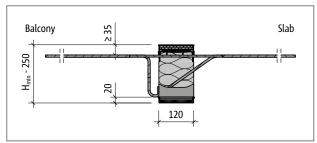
Schöck Isokorb® XT type K-M5, M6: Product section
